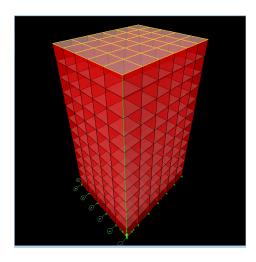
Elevation of twelve storeyed Building Model 1 (full infill)
